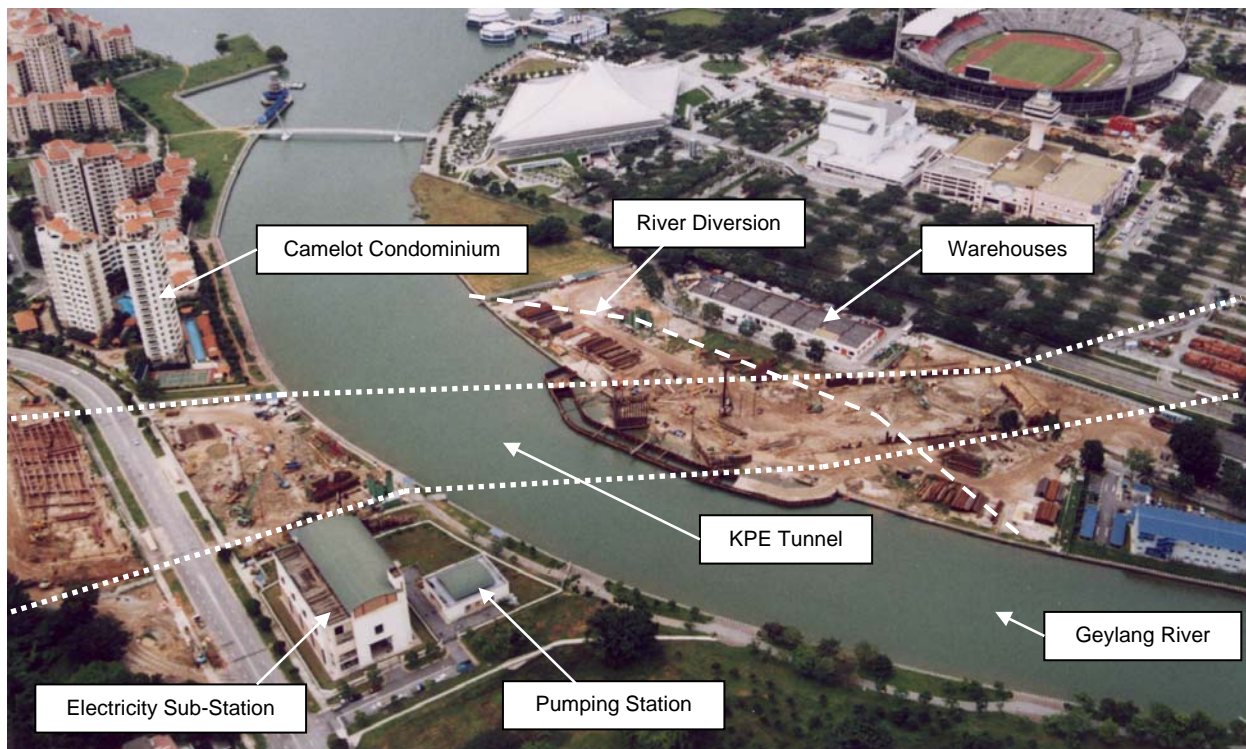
Aerial photo of structures adjacent to KPE C421 alignment.
